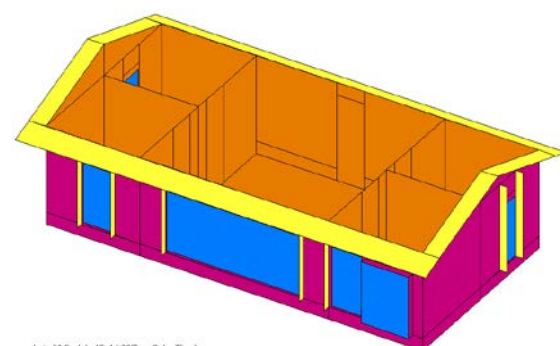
Passive house, rammed earth with shading: with Trombe wall on right side for bedroom
